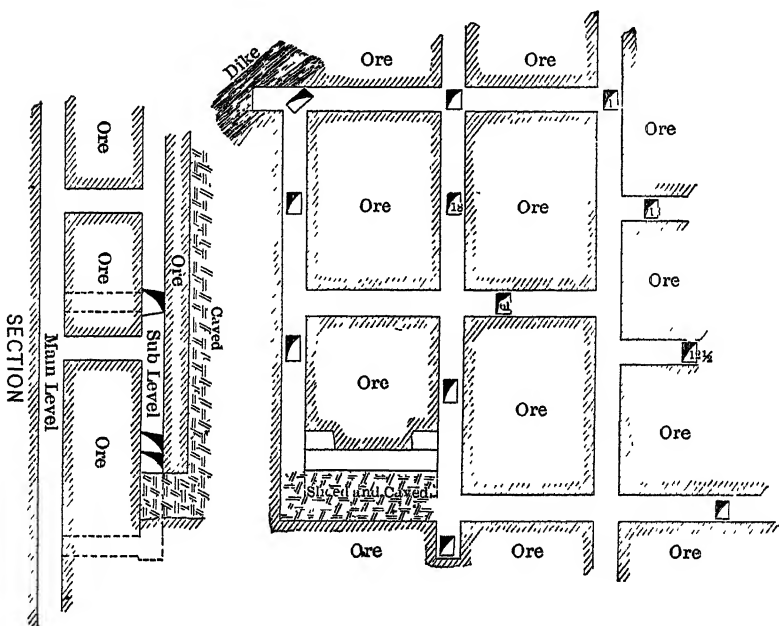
PLAN OF A PORTION OF A SUB-LEVEL, SHOWING METHOD OF BLOCKING OUT ORE AND LOCATION OF RAISES.
